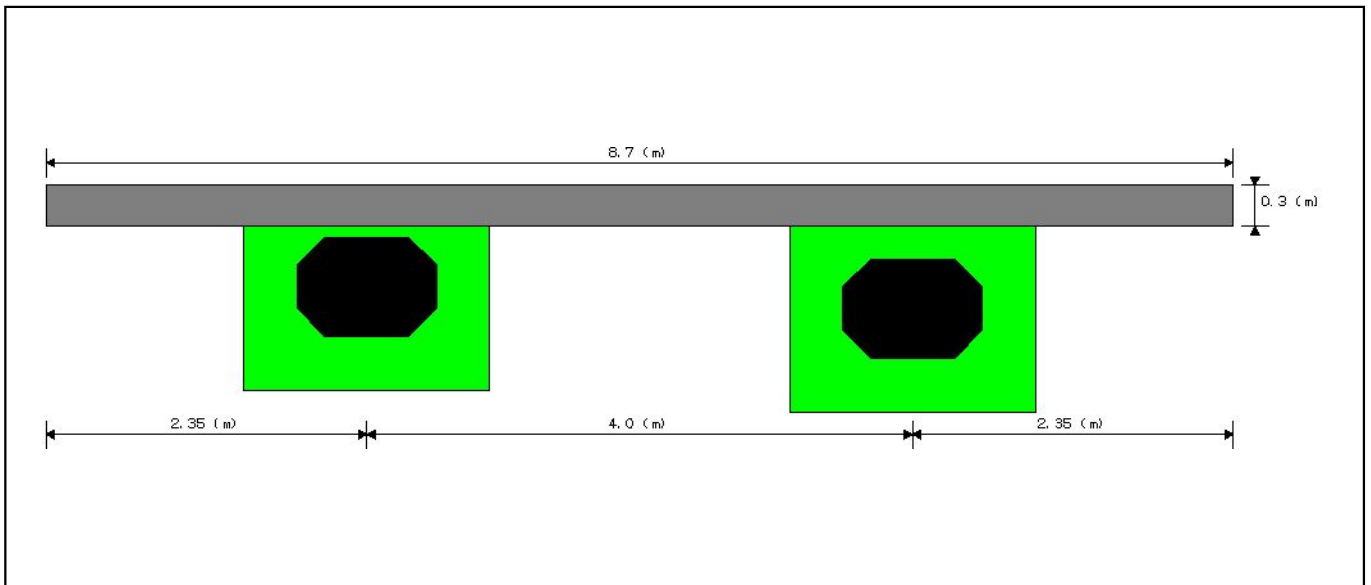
Down station view for girder layout in Span04 - Station 0.0 .
